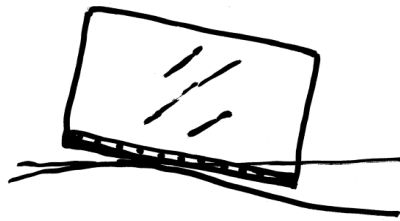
Failure caused by turn over in structure founded on a surface concrete slab.
